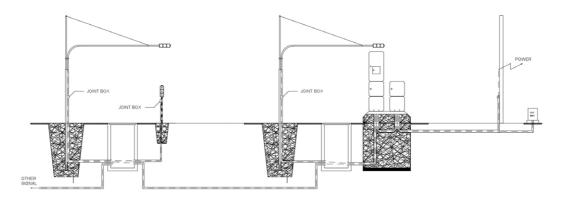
Standard Installation Plan for Local Controllers Located Near Intersections
